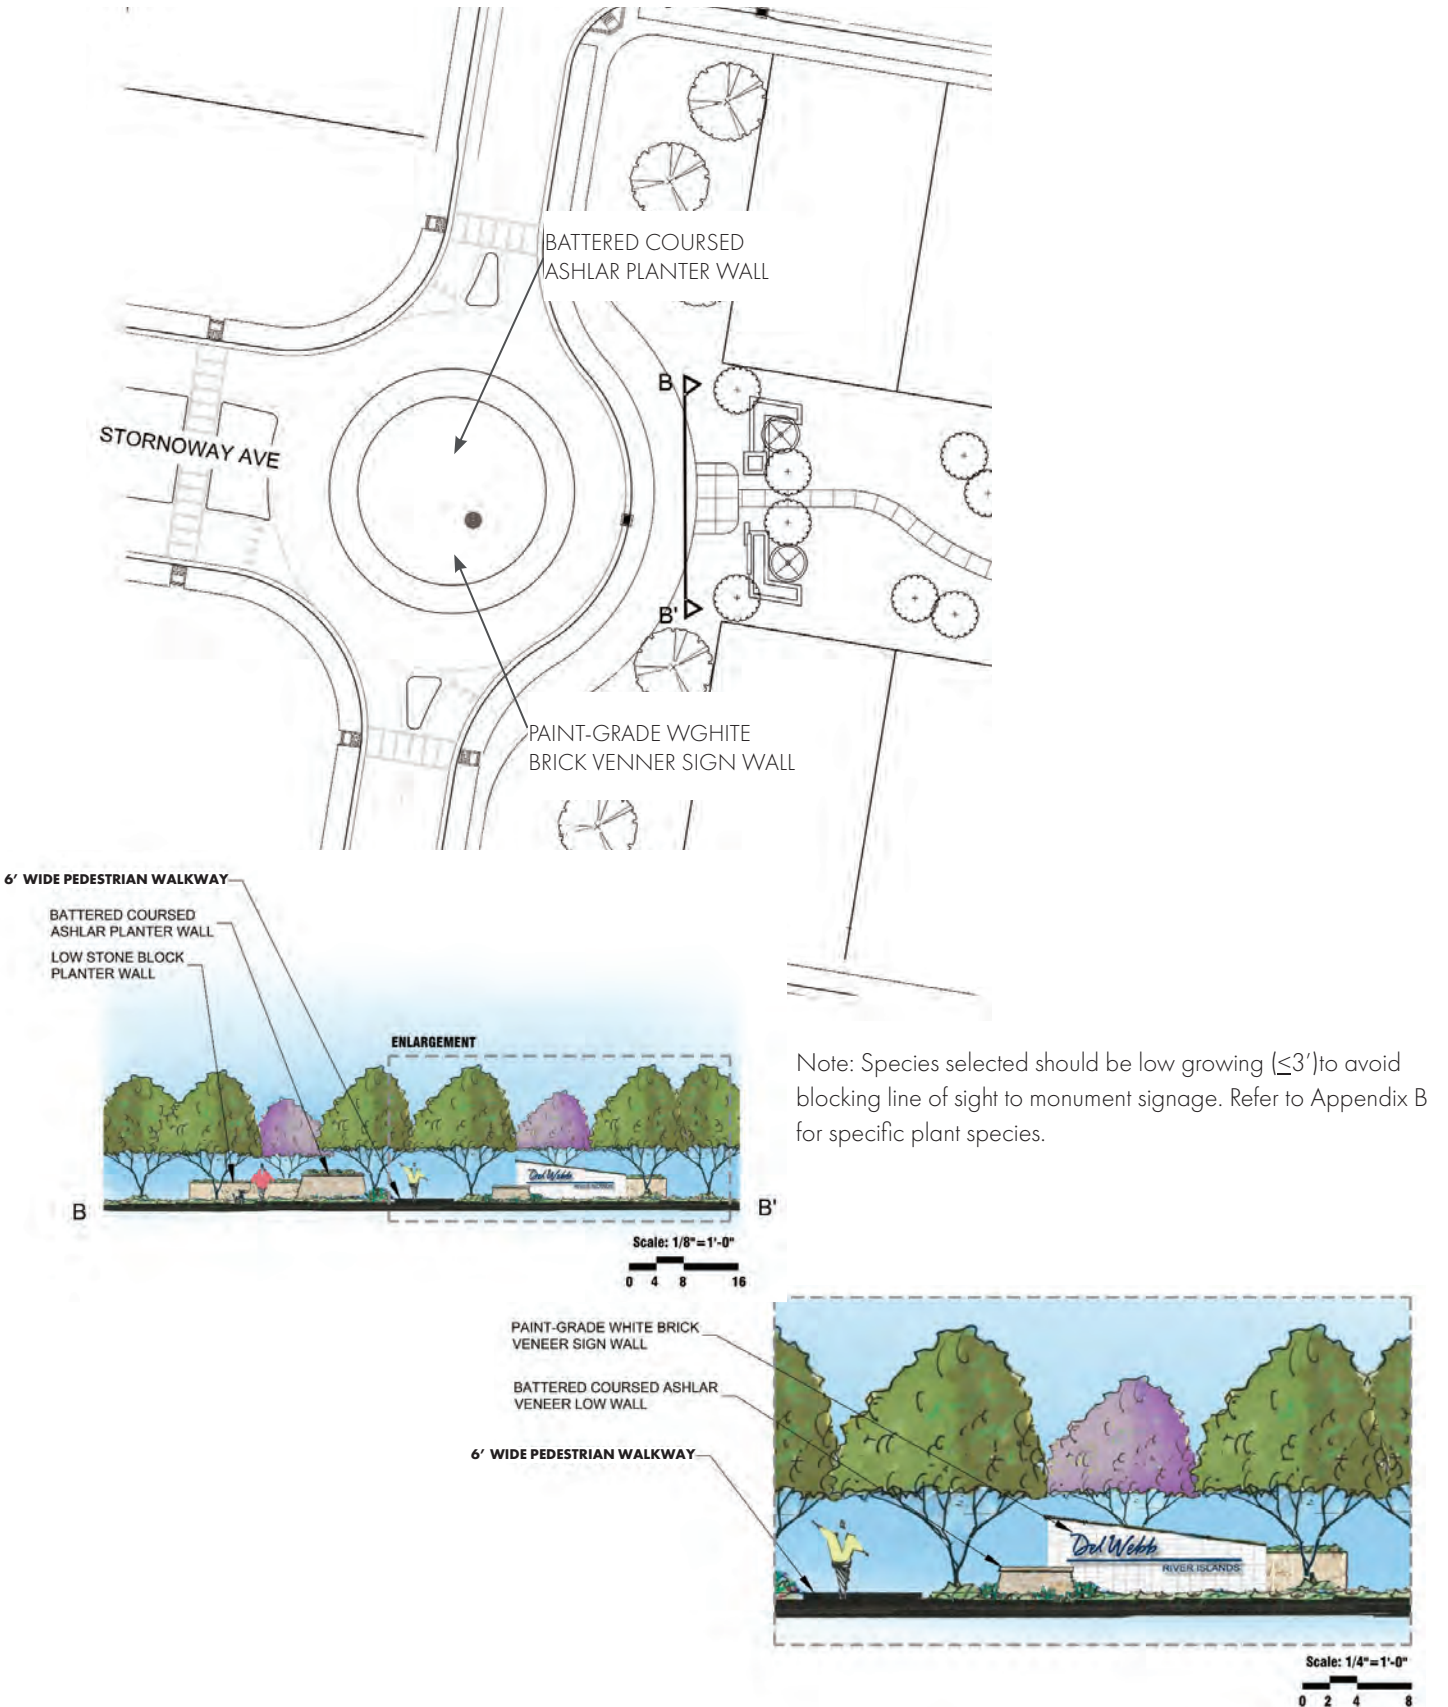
EXAMPLE TYPICAL ROUNDABOUT
